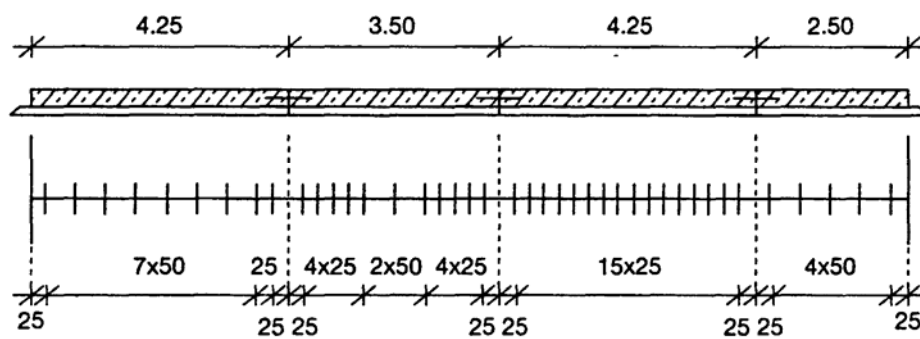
Cross section: Possible dowel arrangements for transversal joints acc. to ZTV-Beton-StB 01 (FGSV 2001)
